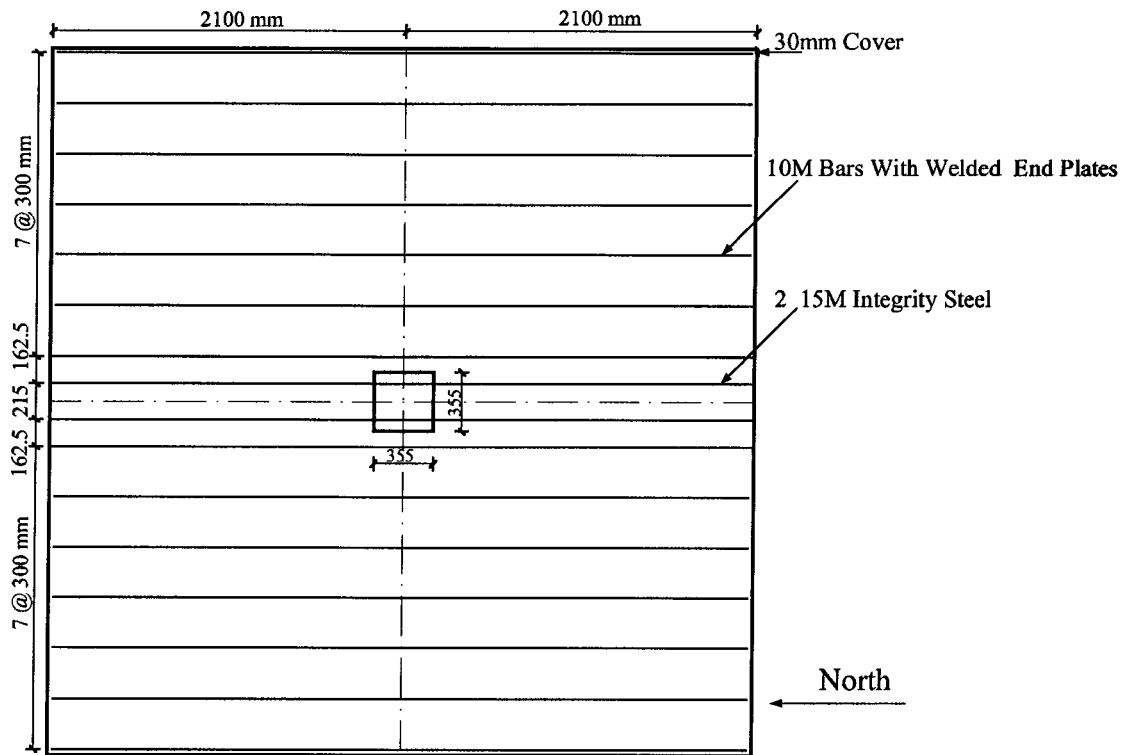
Layout of Positive Reinforcement In N-S Direction
